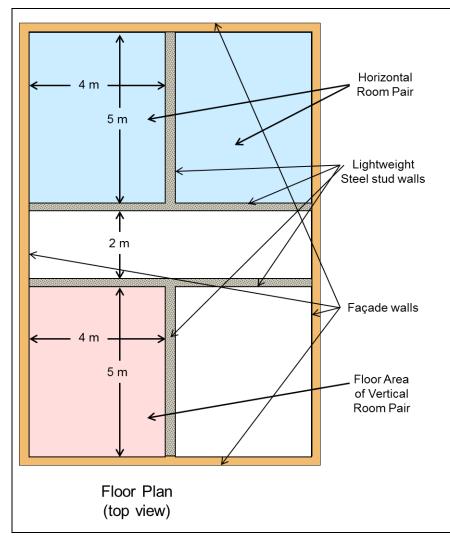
Extended Scenario for the case with concrete structural floors and rigid junctions with a facade wall at the perimeter of the floor. Lightweight framed interior walls divide the interior space into two pairs of adjacent rooms with a corridor between. The room pairs have the same dimensions as in the Standard Scenario used elsewhere in the Guide. The rooms above and below have the same floor plan. The floor area for the horizontal pair is shaded blue. The floor area for the vertical pair is shaded pink.
